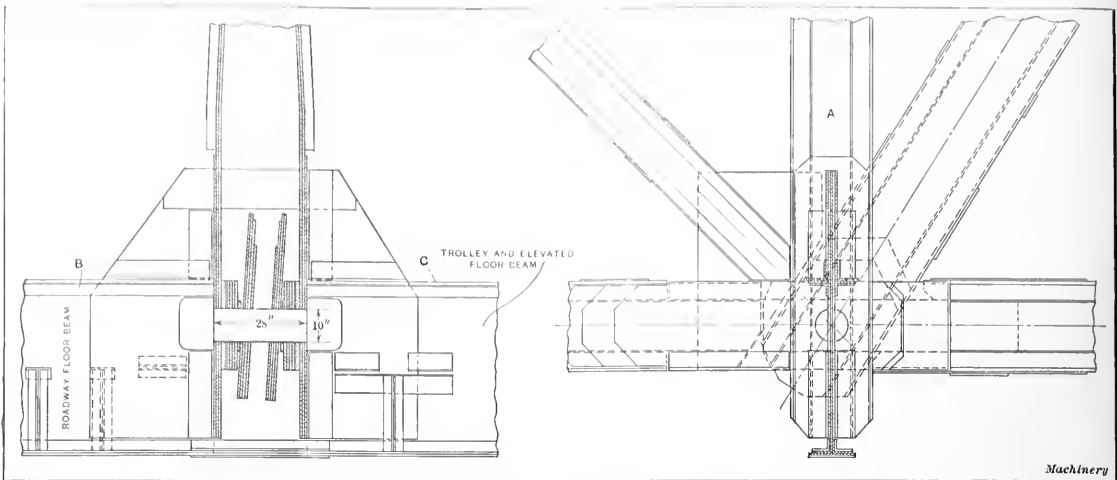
Section and Elevation showing Pin Connection between Approach and Main Span Trusses
